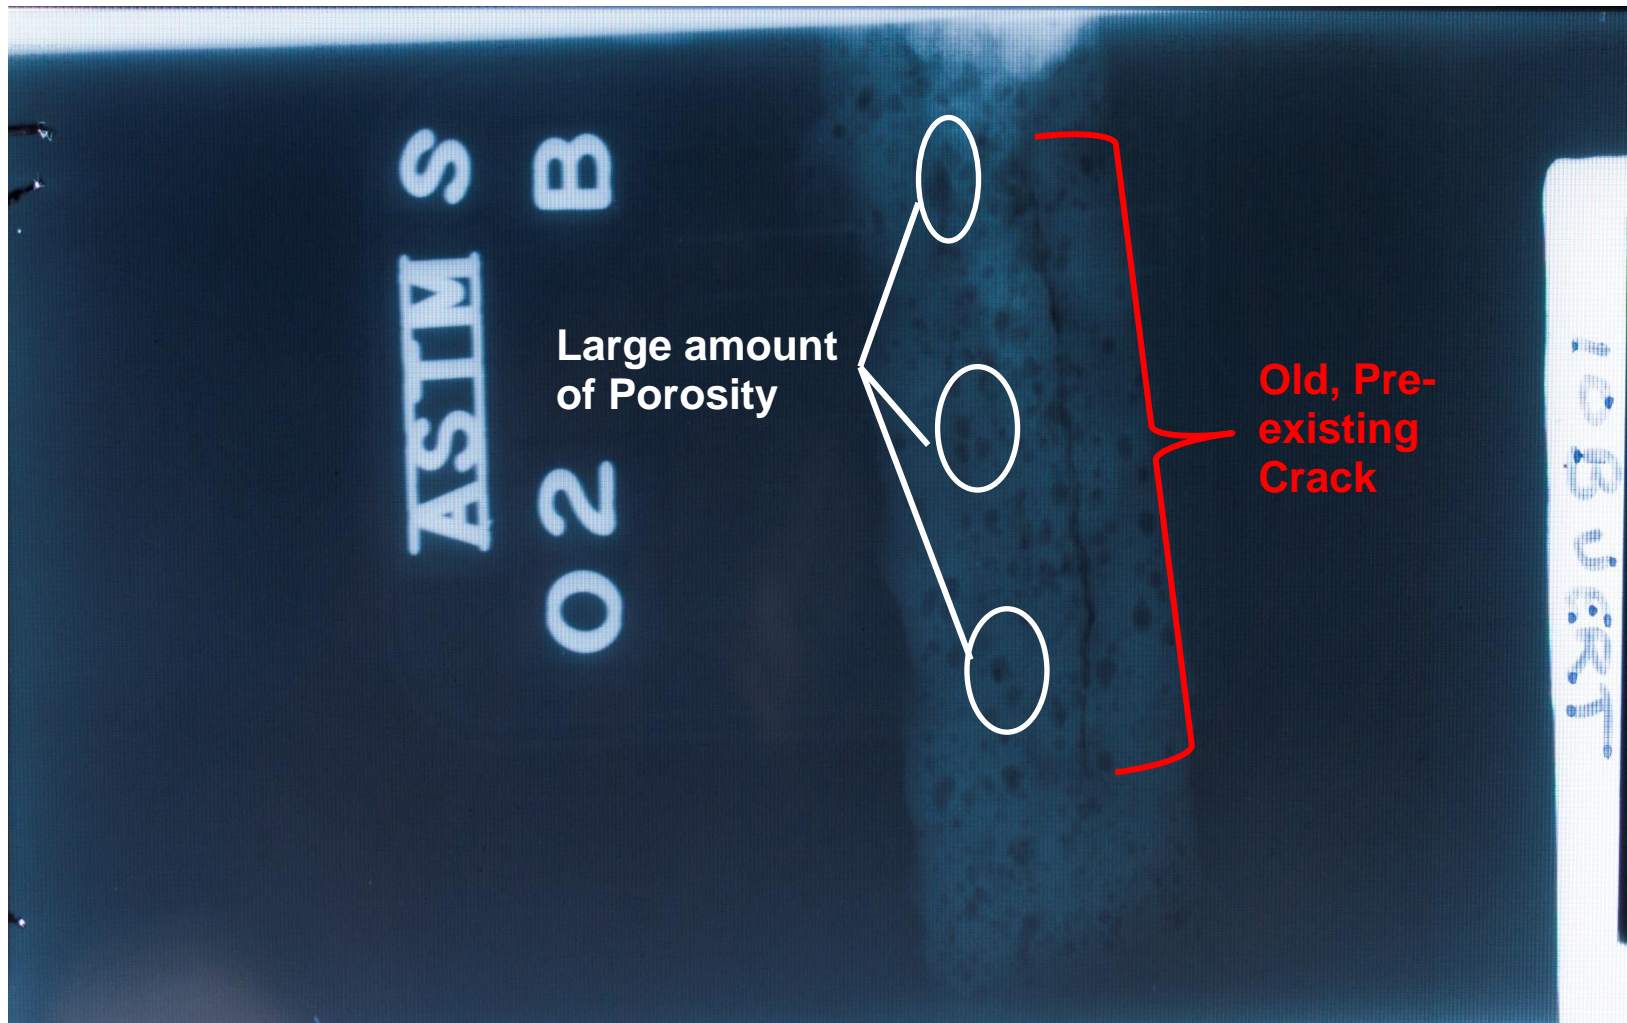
South-West Corner of Bridge, Location 10B - Vert
